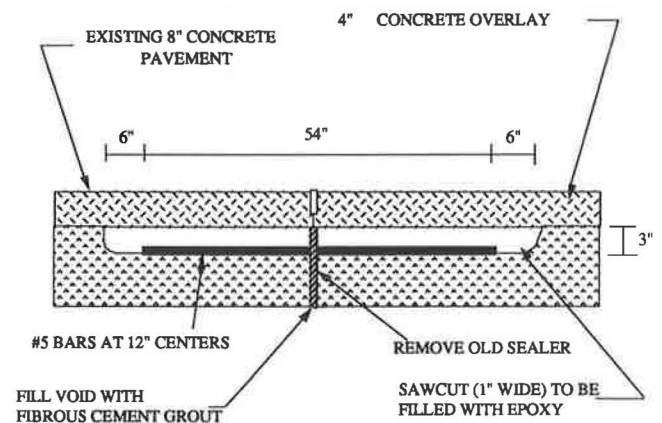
Schematic of longitudinal construction joint repair technique.
